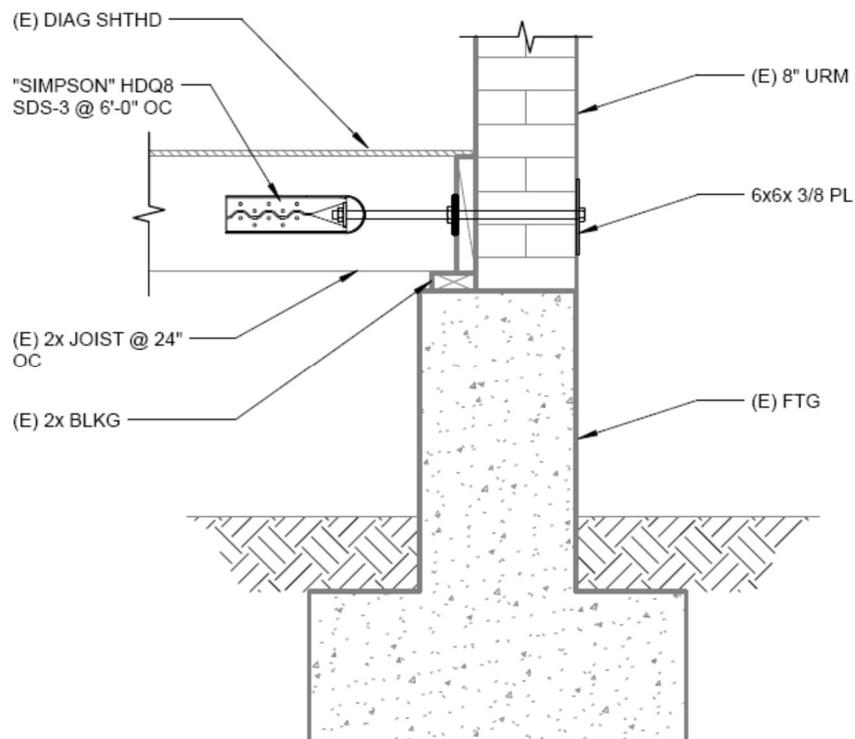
Typical wall and floor construction of Ramp 100 buildings
